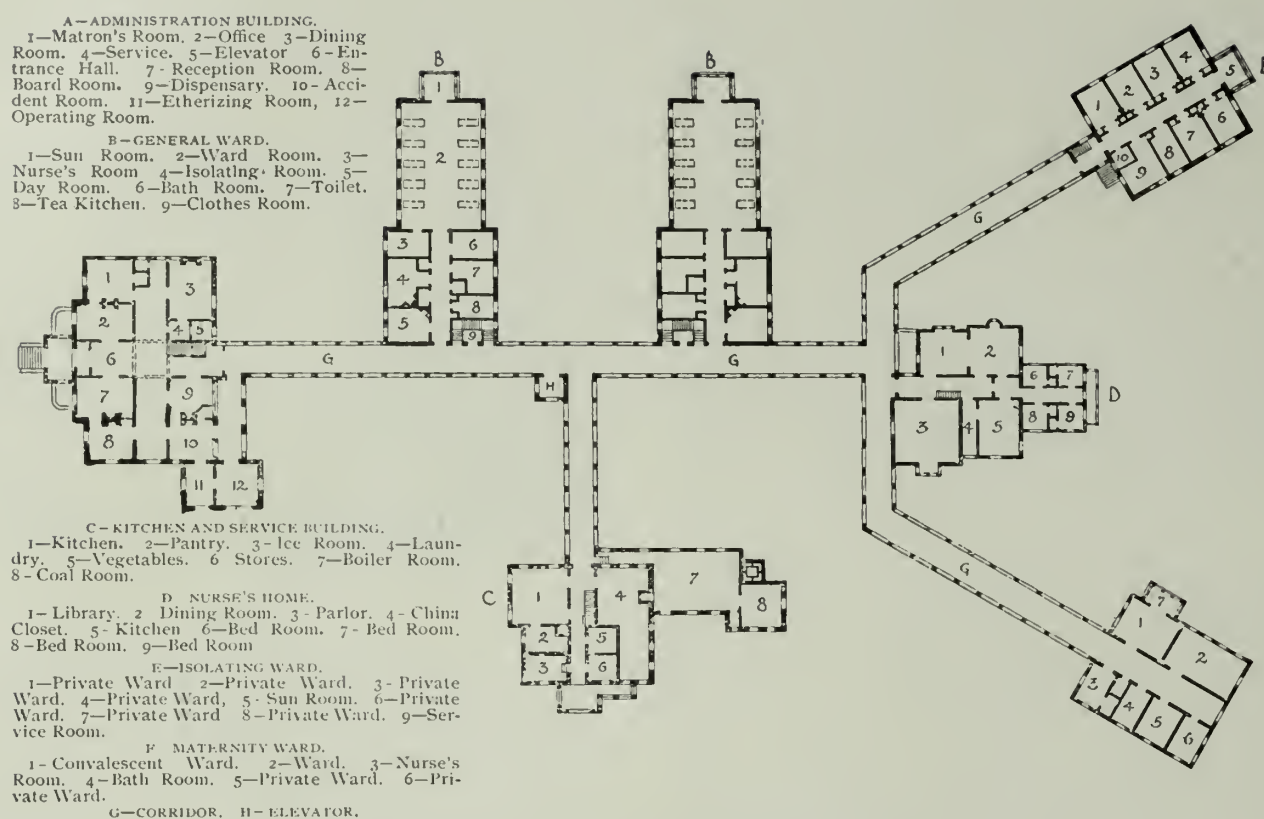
PLAN, BACKUS HOSPITAL, NORWICH, CONN.
